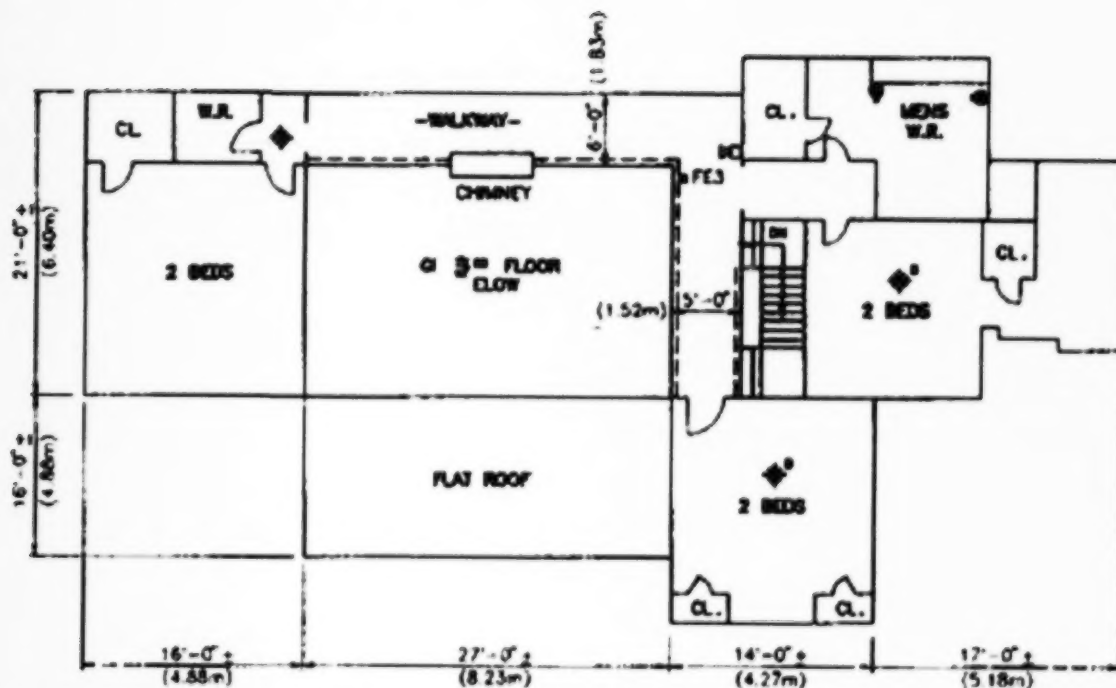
STONEHEDGE SECOND FLOOR PLAN
